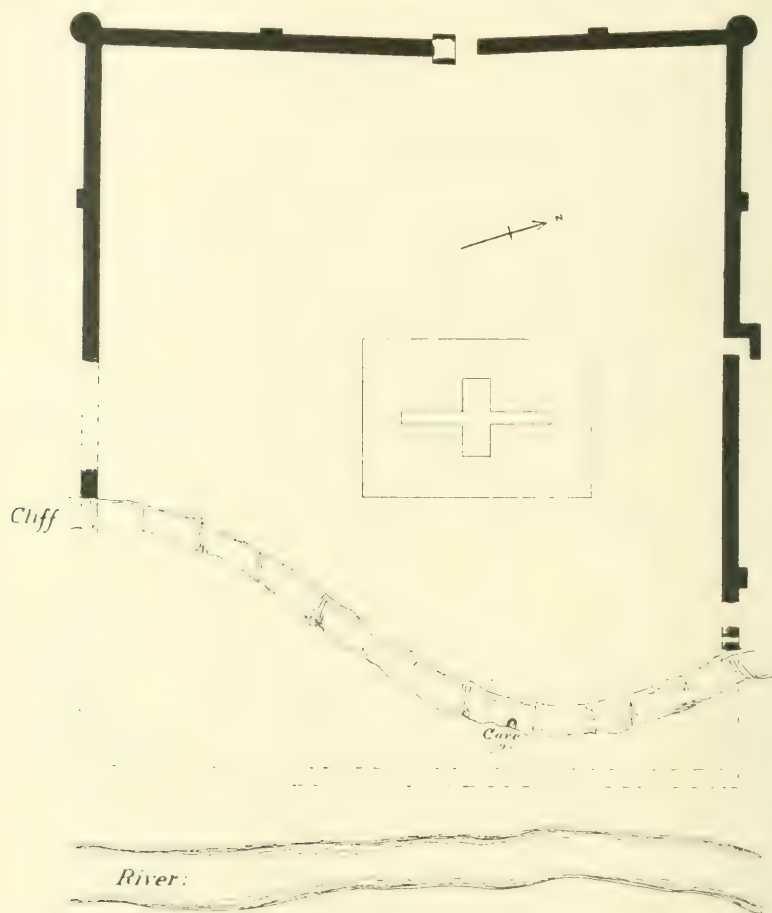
The Castrum at Richborough : Sketch Plan.
